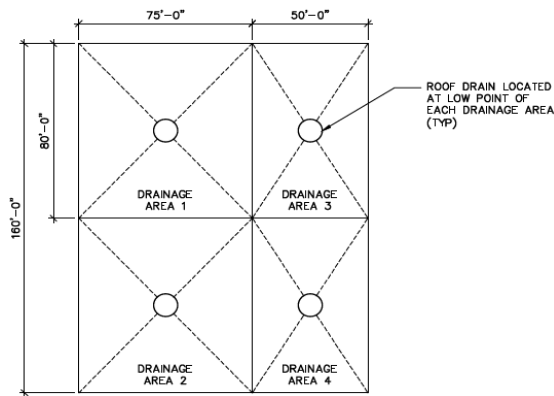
Plan View of Multi-Directionally Sloped Blue Roof
